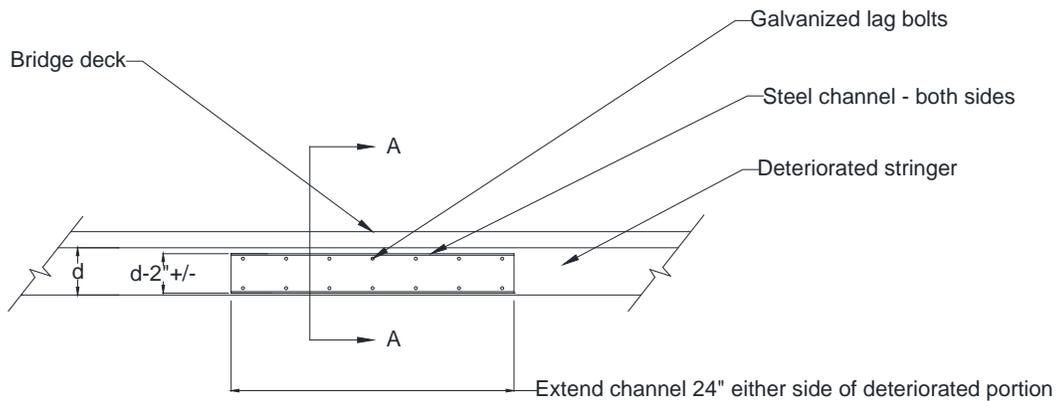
Strengthening of timber girder or stringer – flexural reinforcement, steel channel
